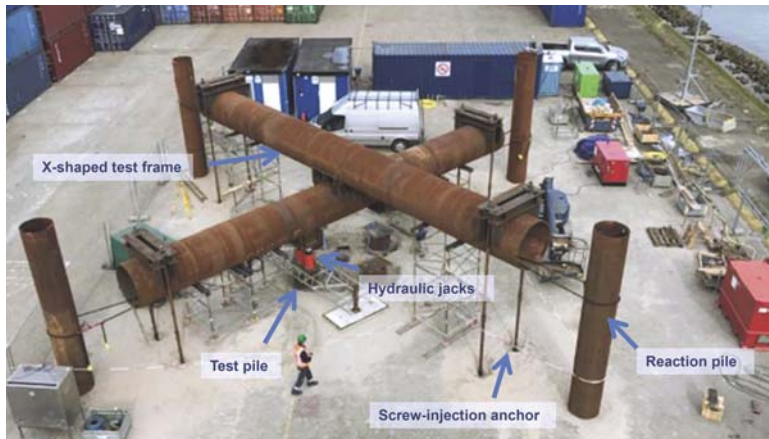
Overview test setup pile load test Beneluxhaven.
